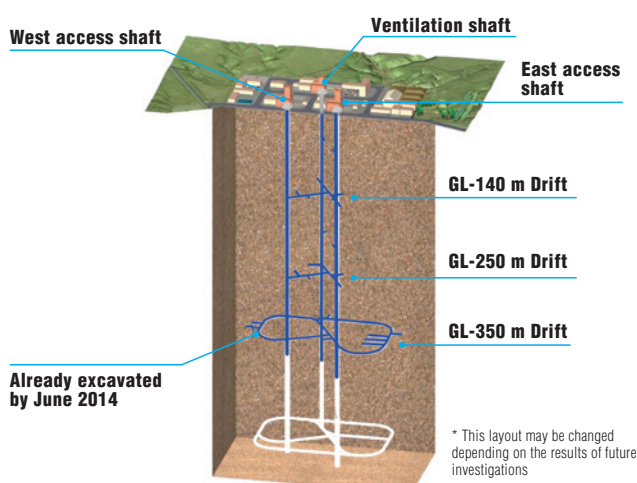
Layout of the Horonobe Underground Research Laboratory
